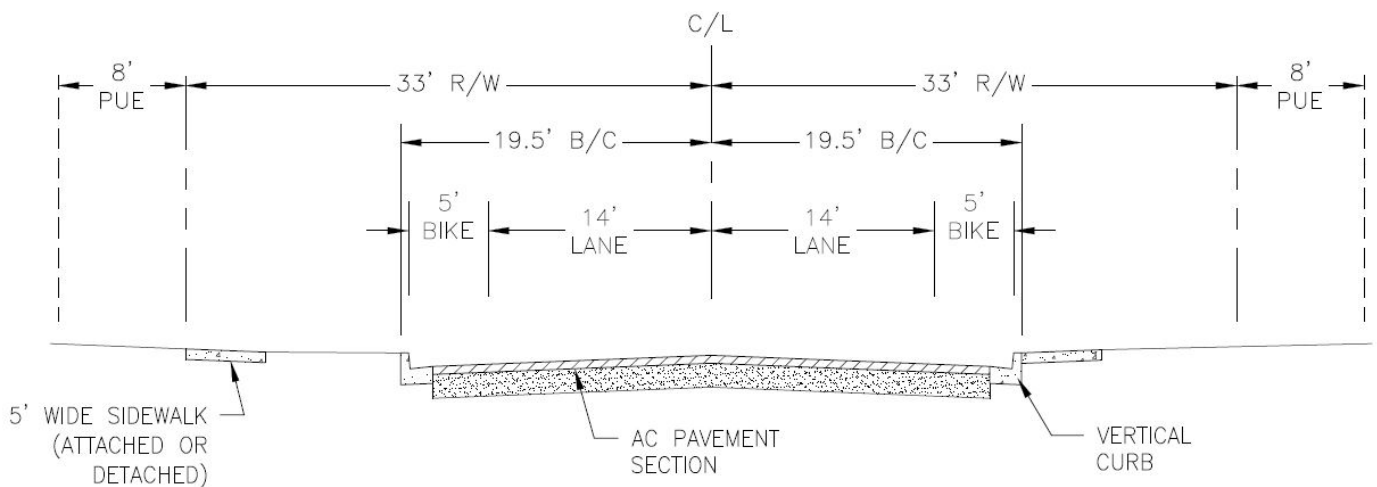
Minor Collector Street Section – “Pioneer Streets”
